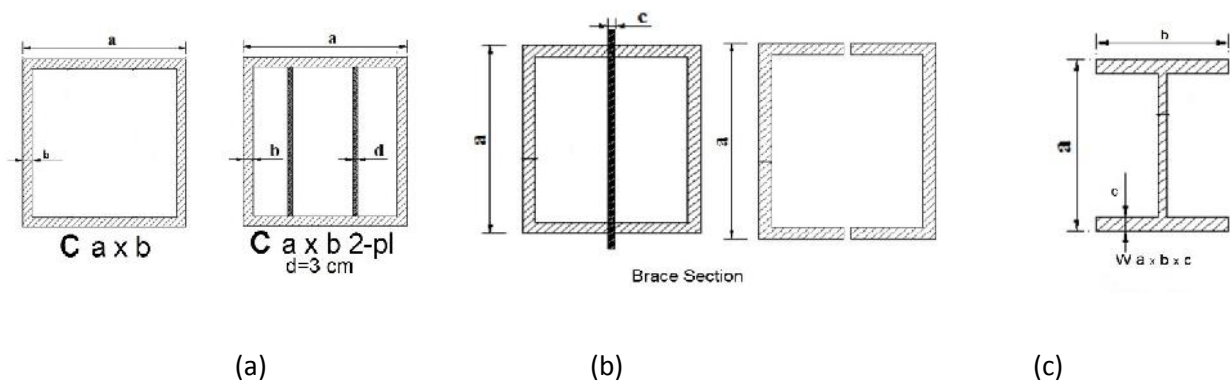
(a) Columns section, (b) Braces section, (c) Beams section
